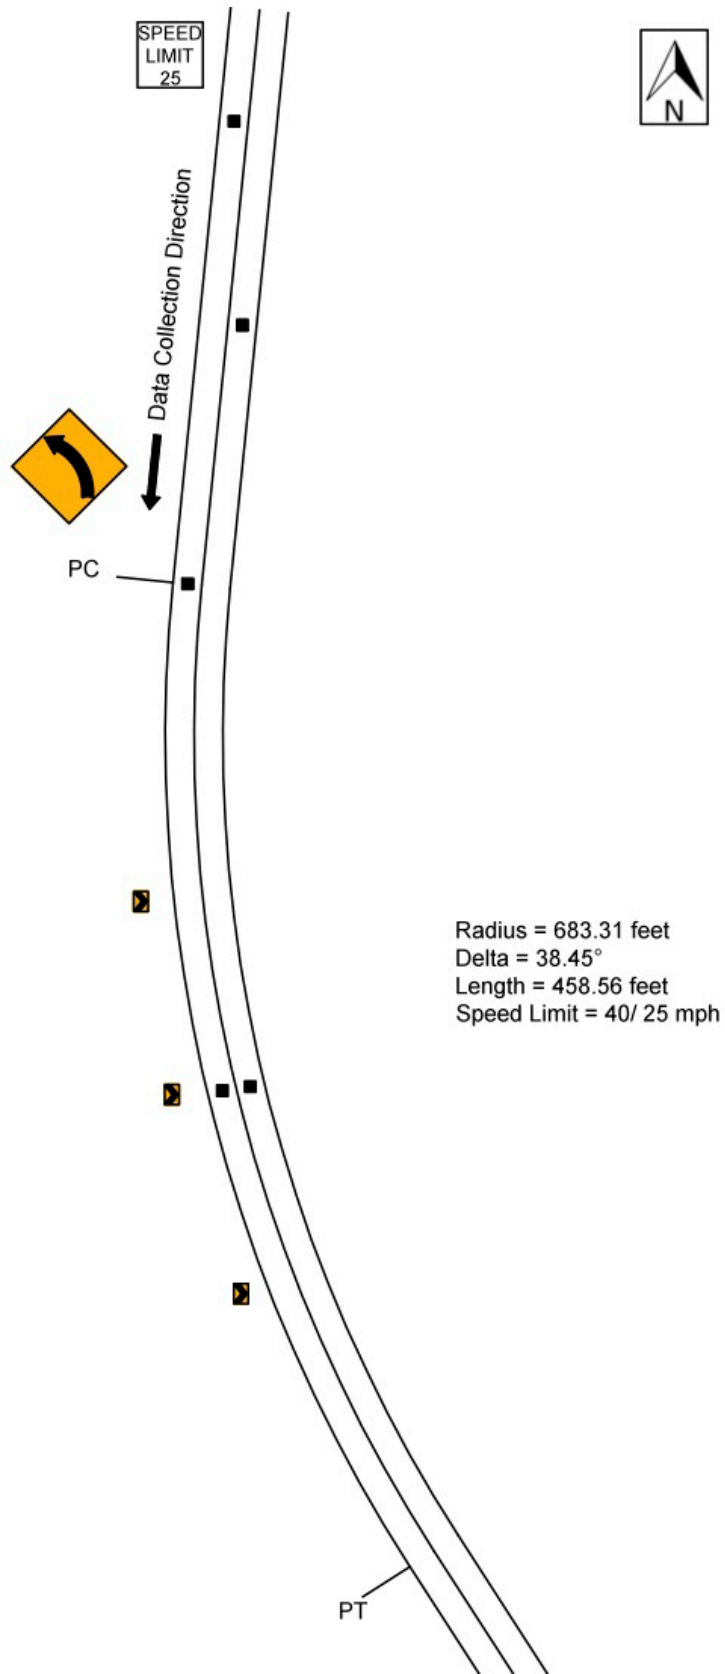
Diagram. Geometric layout of southbound Reed Road (not to scale).
